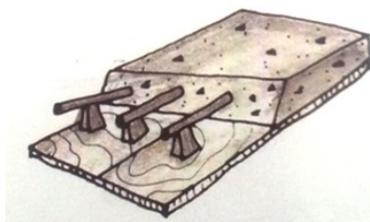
Proper reinforcement with non-corroding spacers should be provided
